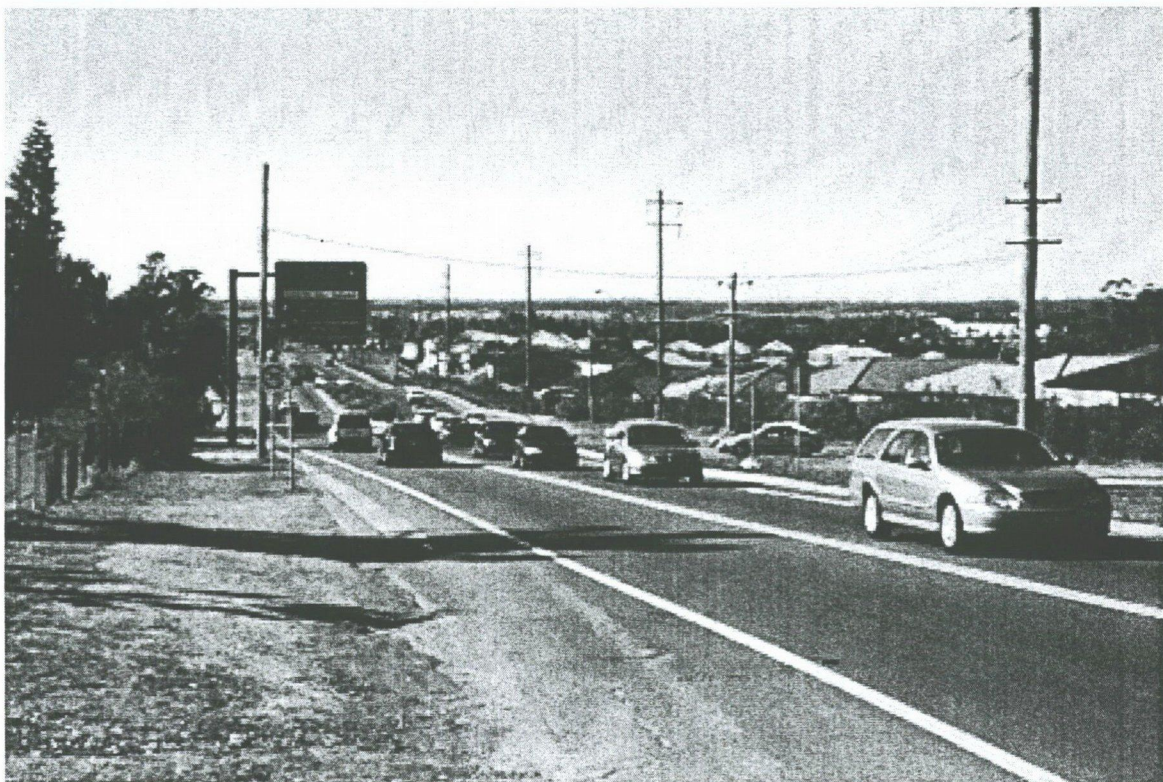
Sunnyholt Road Northbound from WSO Corridor
